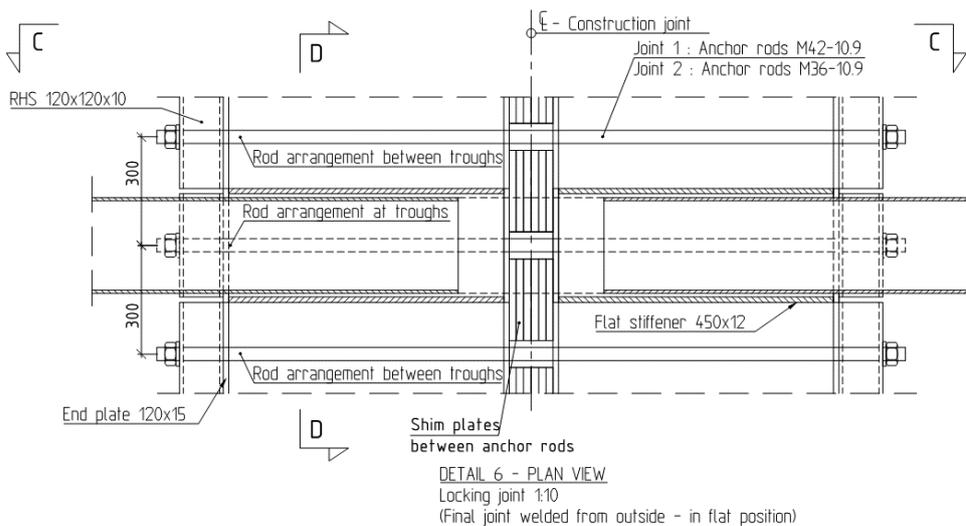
Locking joint for deck plate, construction joint 1 & 2, plan view
